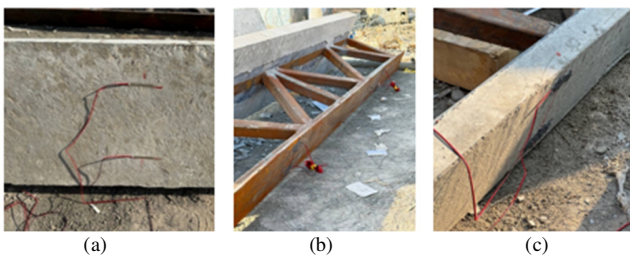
Position of the strain gauges: (a) installation of the strain gauge on top concrete, (b) strain gauge on bottom steel, (c) installation of the strain gauge on bottom concrete deck slabs.
